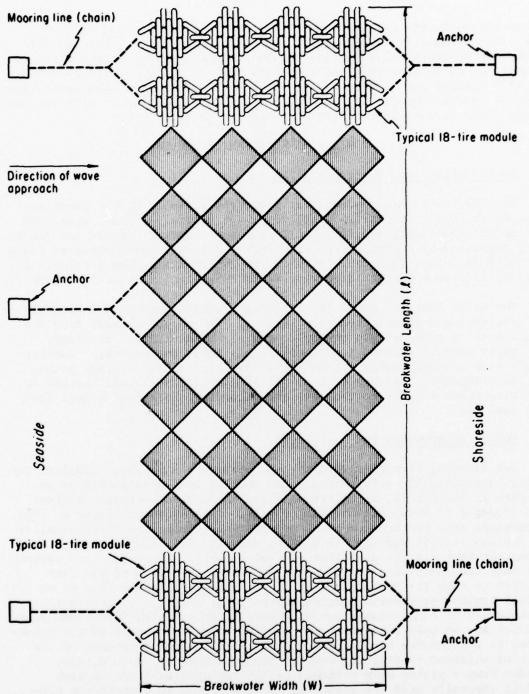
Typical anchoring arrangement for a four-module-wide FTB.
